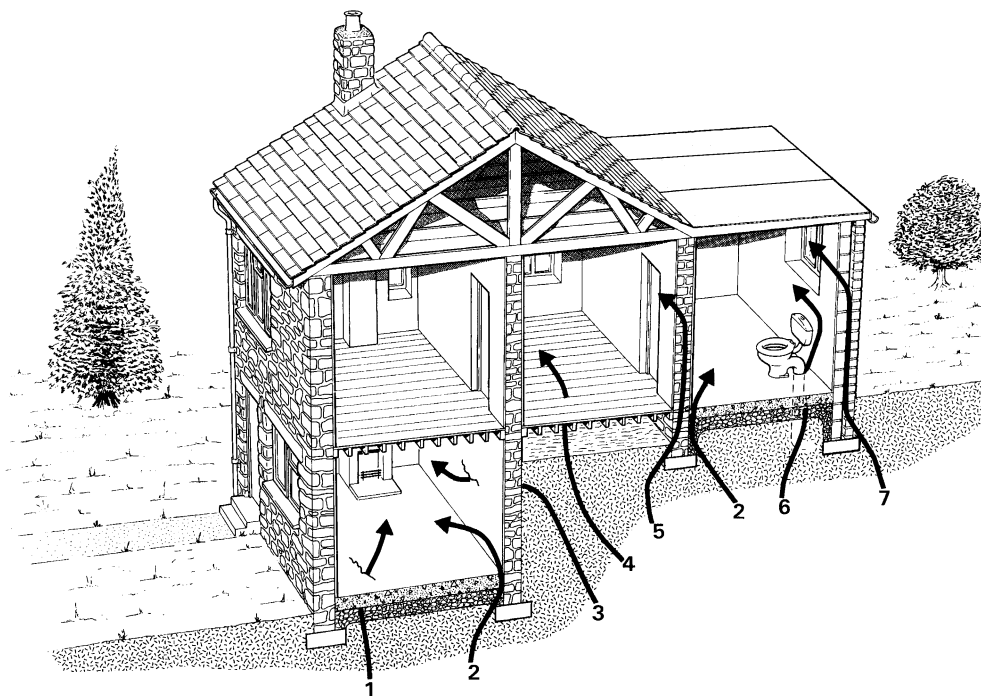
Routes by which radon enters a dwelling. (Reproduced from BR211, Scivyer 2007; Ingress routes: 1- cracks in solid floors; 2 - construction joints; 3 - cracks in walls below ground; 4 - gaps in suspended floors; 5 - cracks in walls; 6 - gaps around service pipes; 7- cavities in walls)
